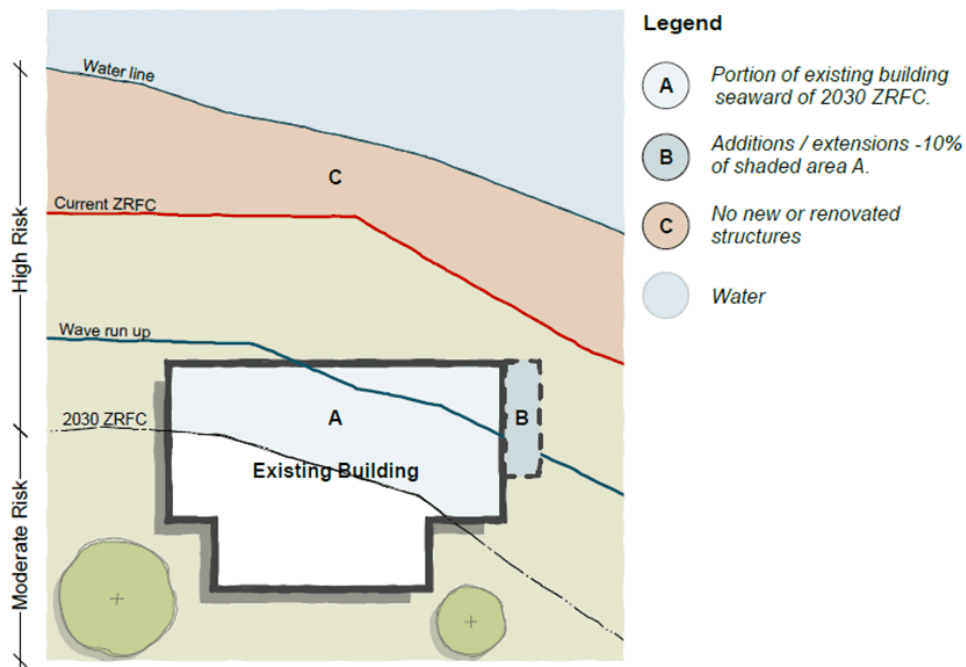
Plan indicating acceptable solutions area of building in high risk area
